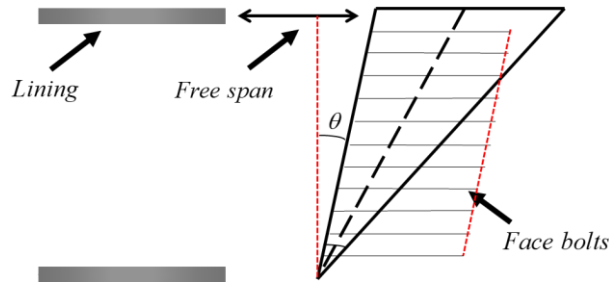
Face bolts arrangement of inclined excavation face (middle section of tunnel)
